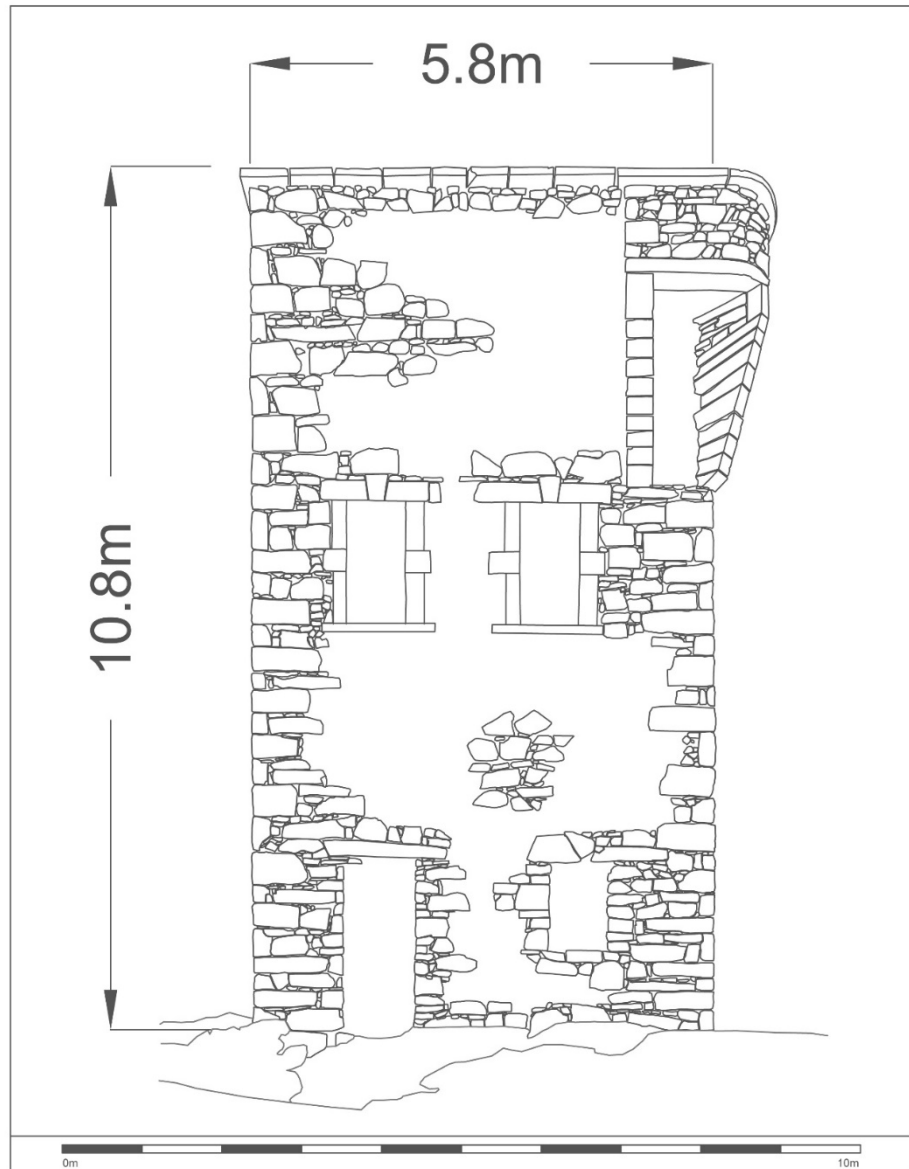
External elevation of the south-east wall of the signal tower at Golam Head Signal Station.
